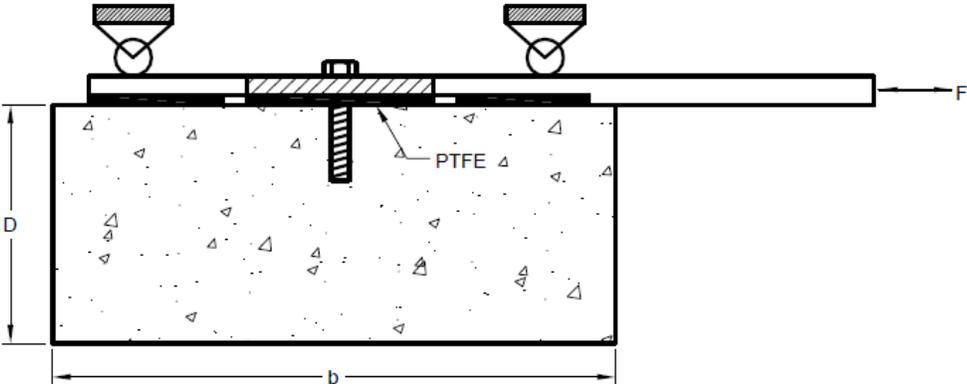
TYPICAL ALTERNATING SHEAR TEST SETUP
